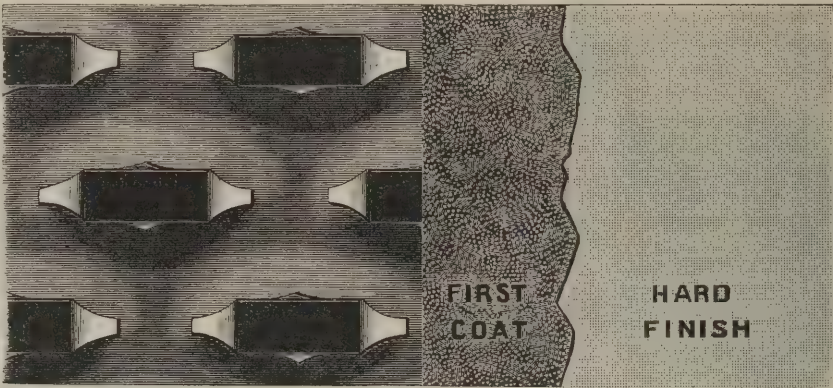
Elevation of Section of Lathing with Plastering Applied to a Part.
